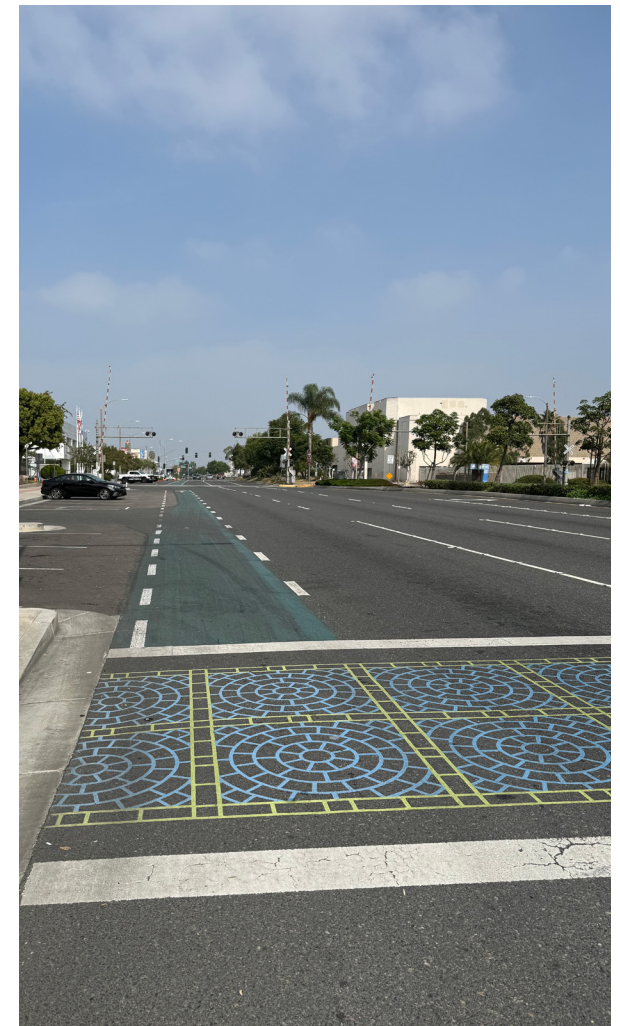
Existing cross-section: Hawthorne Boulevard from north City limits to Imperial Hwy
